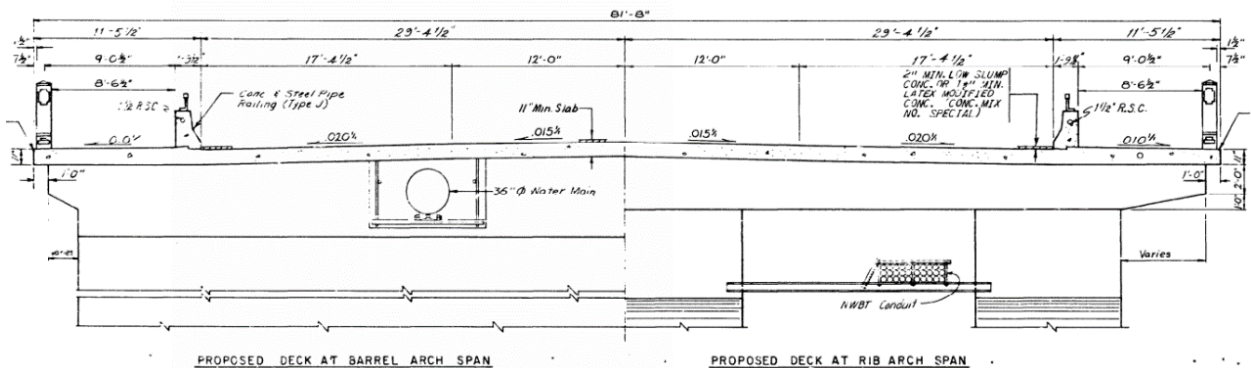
Typical bridge deck cross section in arch spans (from 1980 plans).
